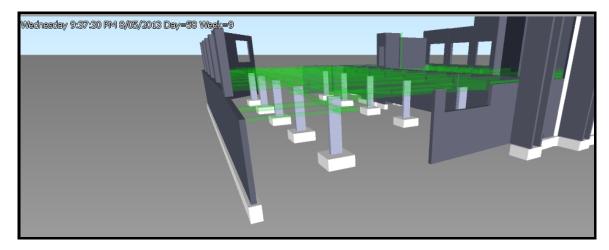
Building Approval Stage (Viewpoint 1) - Works Complete Week 9
